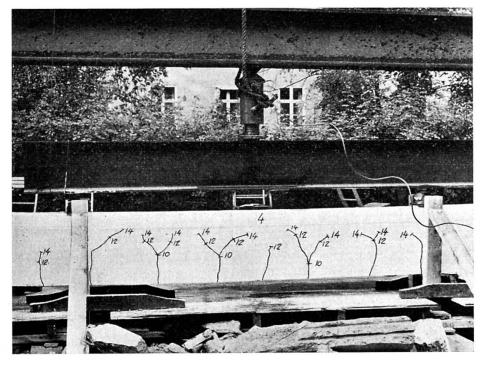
Crack Distribution in the Non-Grouted R-Beam (R).
